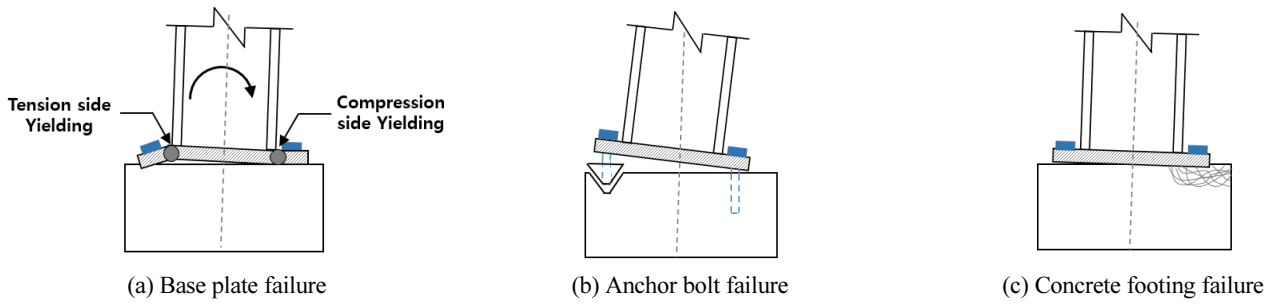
Failure Mode of Exposed Steel Column-Base Plate Connection
